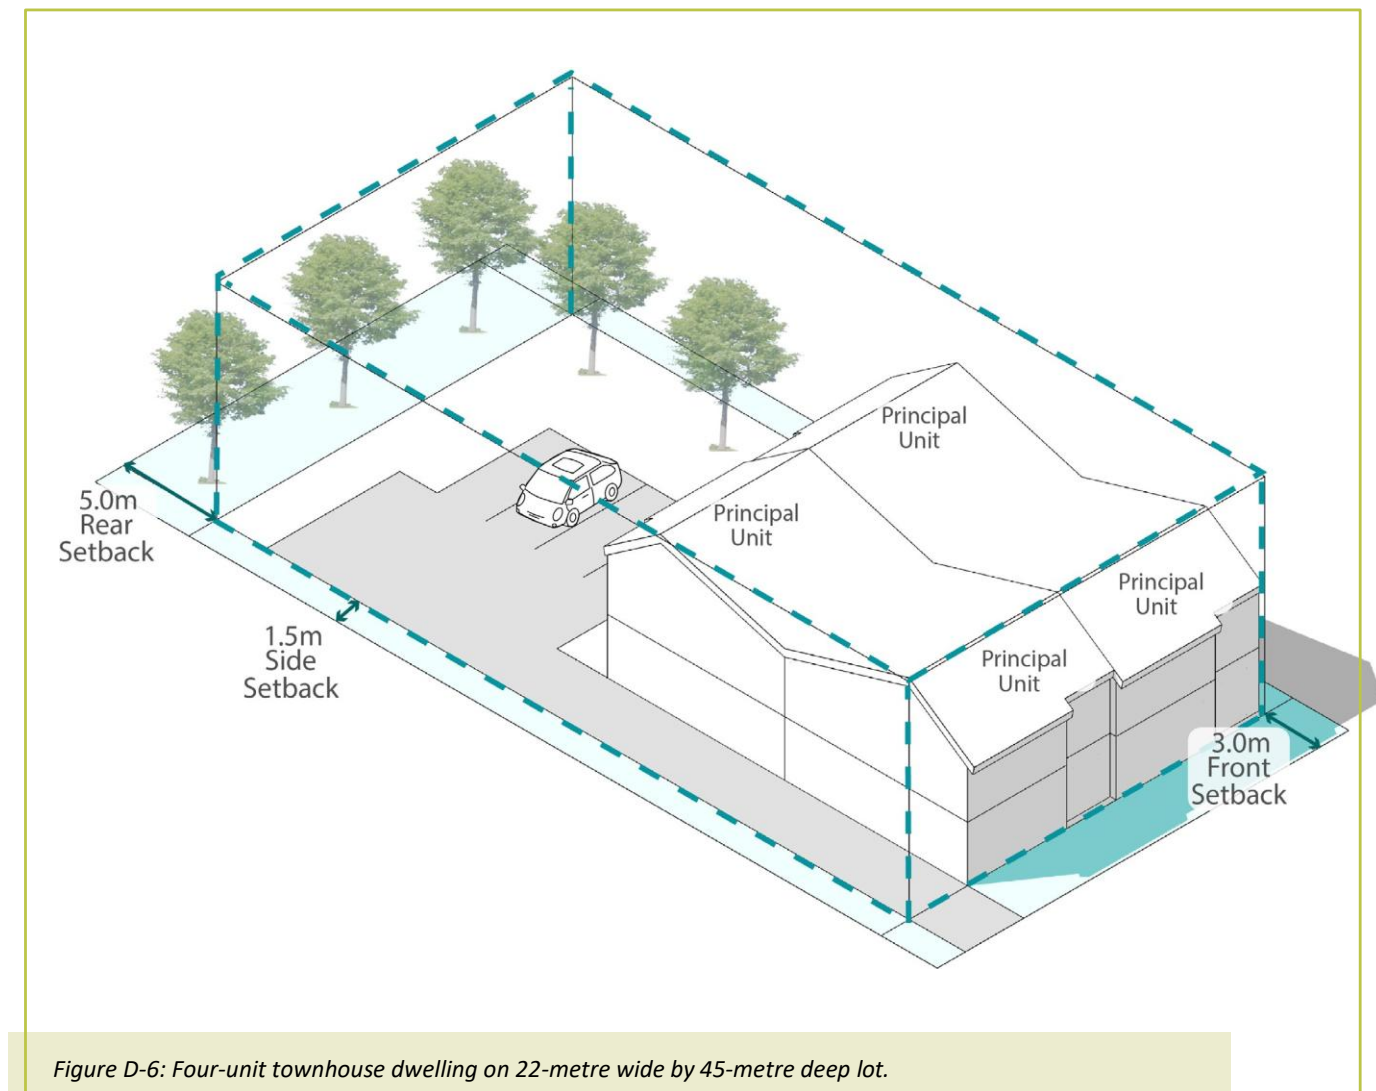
Four-unit townhouse dwelling on 22-metre wide by 45-metre deep lot.
